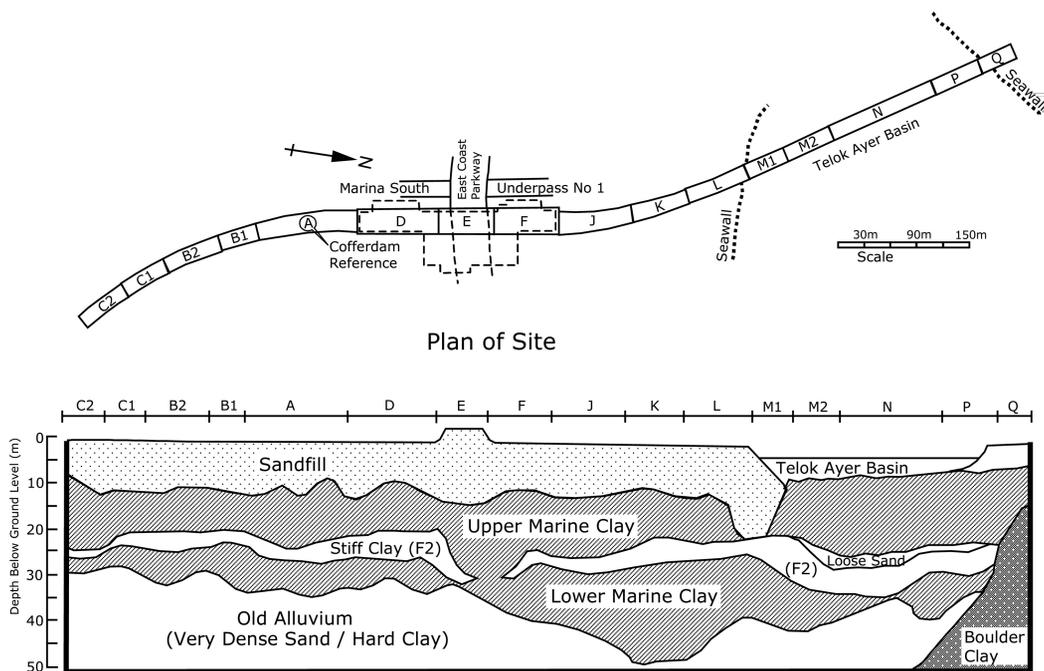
Marina Bay Station and tunnels (after Clarke & Prebaharan, 1987).
